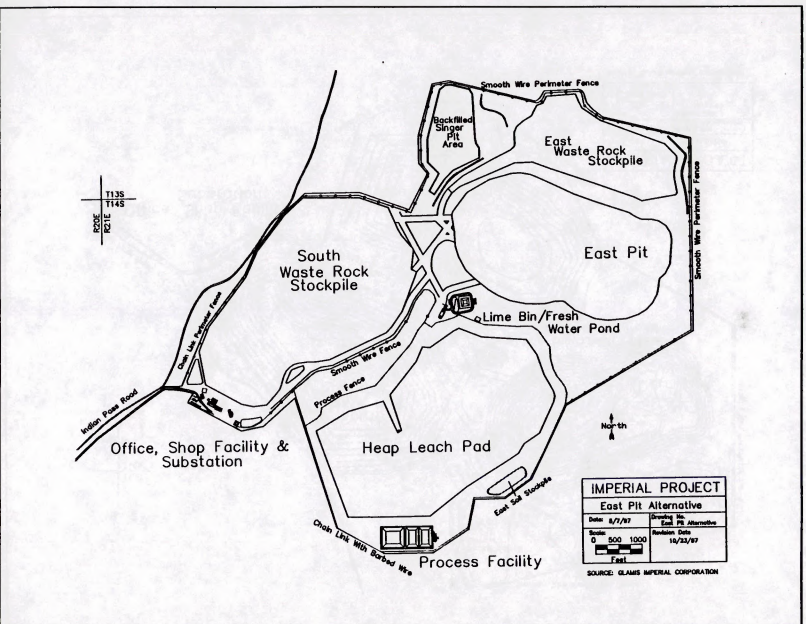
East Pit Alternative - Mine and Process Area Facility Details
